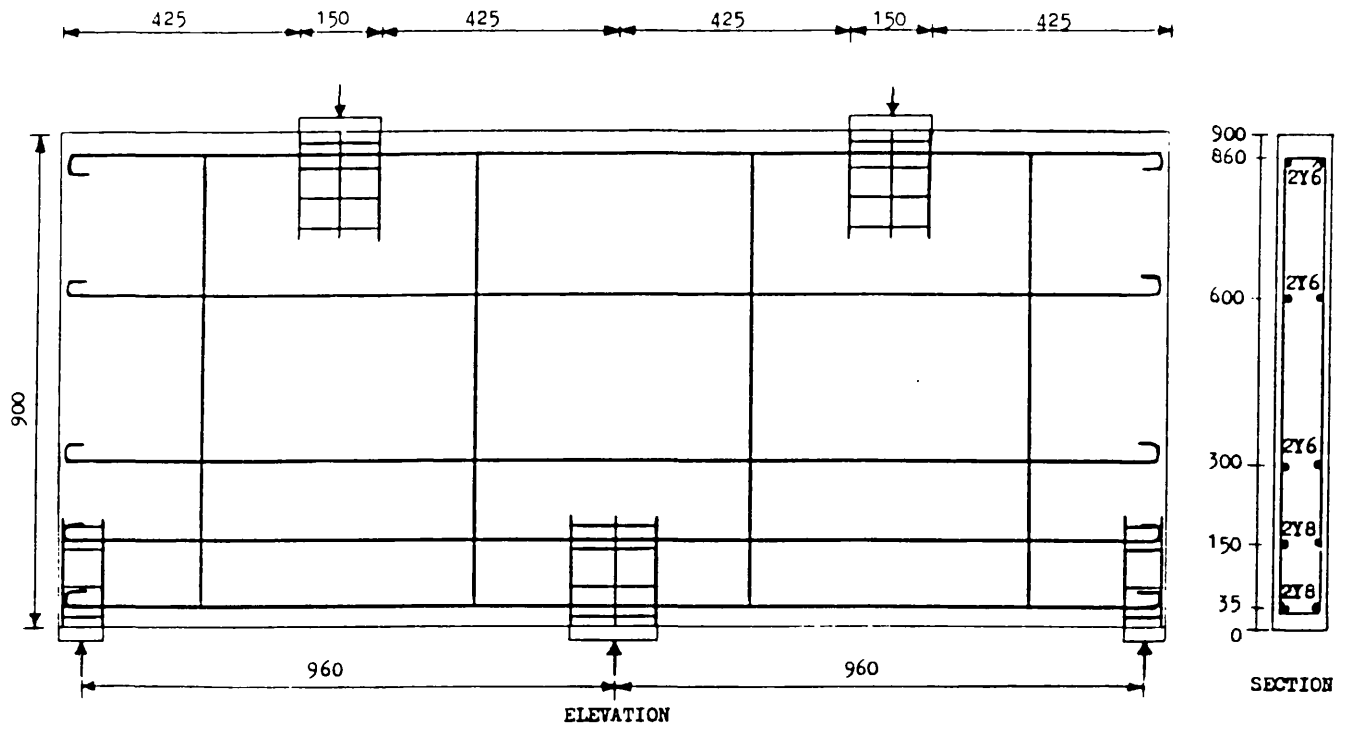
Dimensions and reinforcing details of girder TRGRAS3
